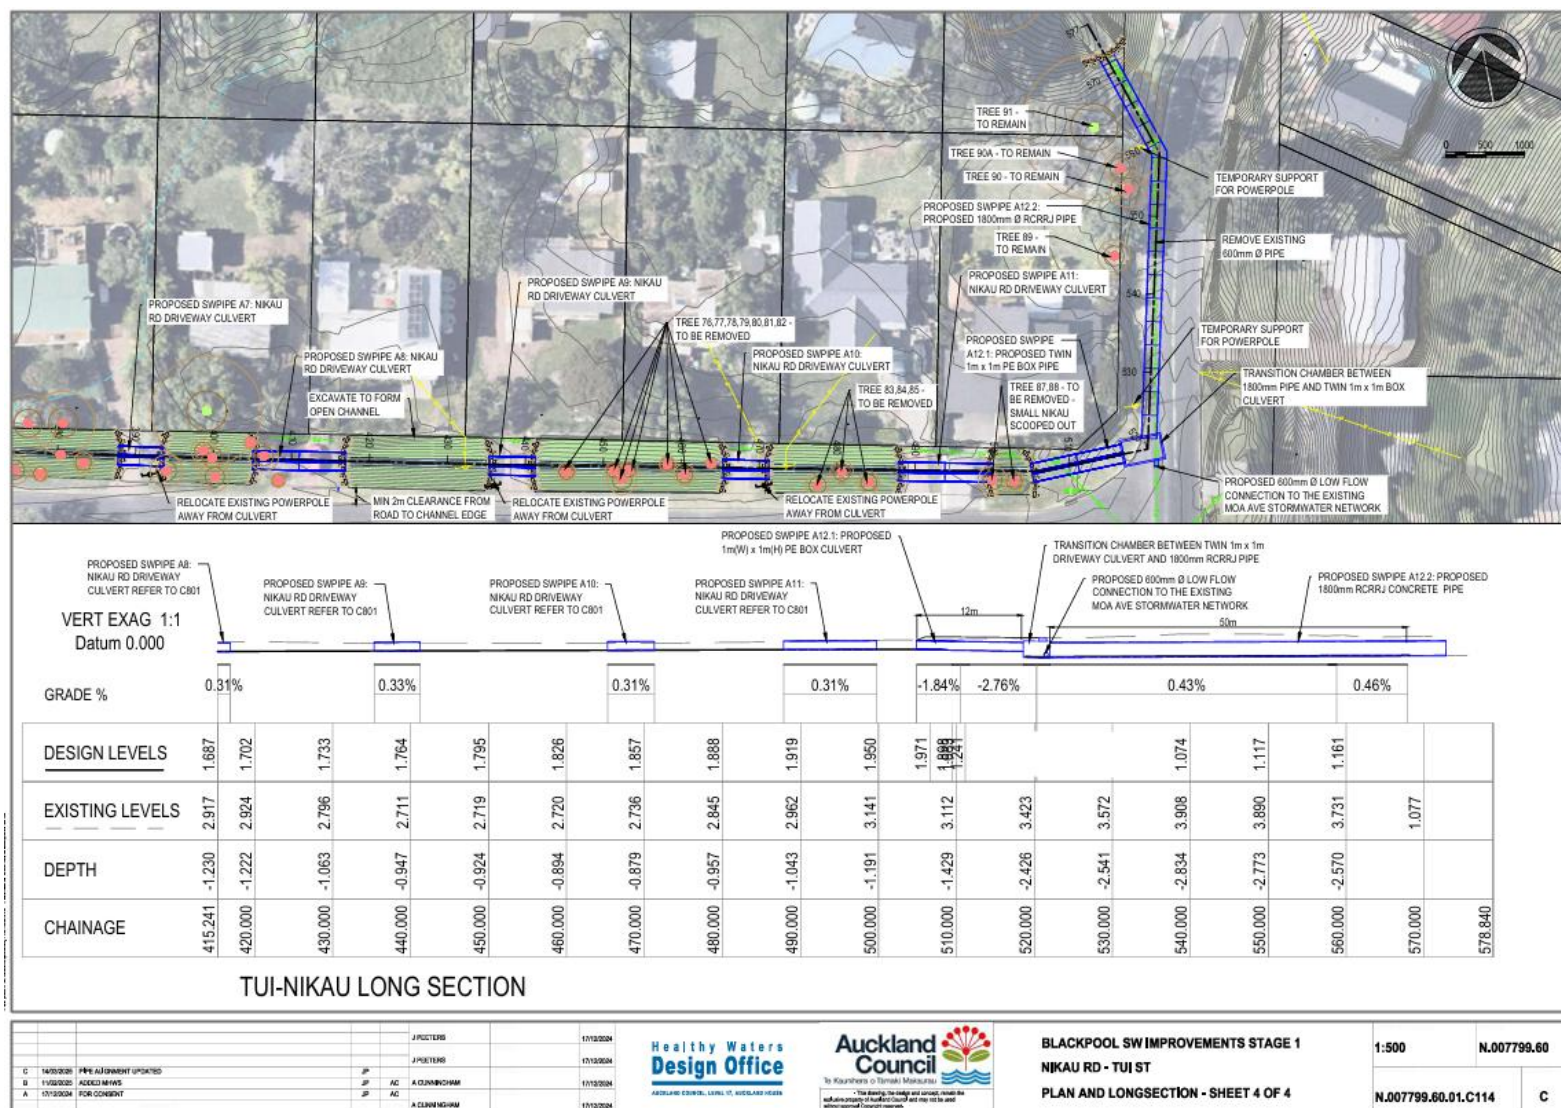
Blackpool SW Improvements Stage 1 Nikau Rd – Tui St Plan and Longsection – Sheet 4 of 4
